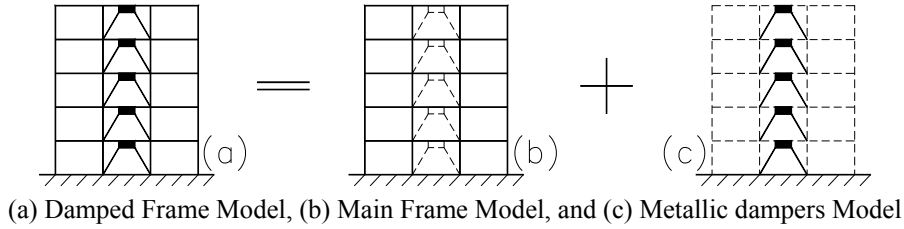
Analytical model of a damped frame structure with metallic dampers
